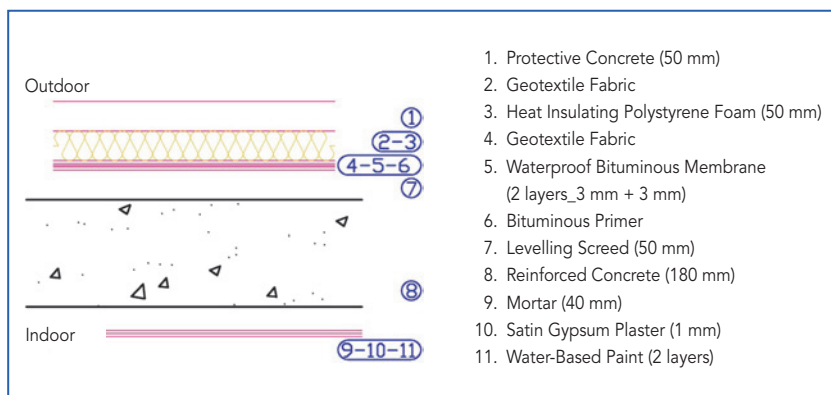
A typical roof detail in new residential buildings [1, 2].
